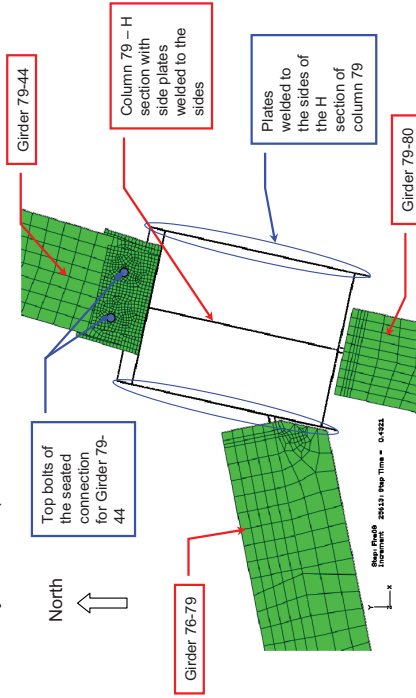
Plan view of girders intersecting at column 79 (Connectors representing bolts are shown by the blue dots)
